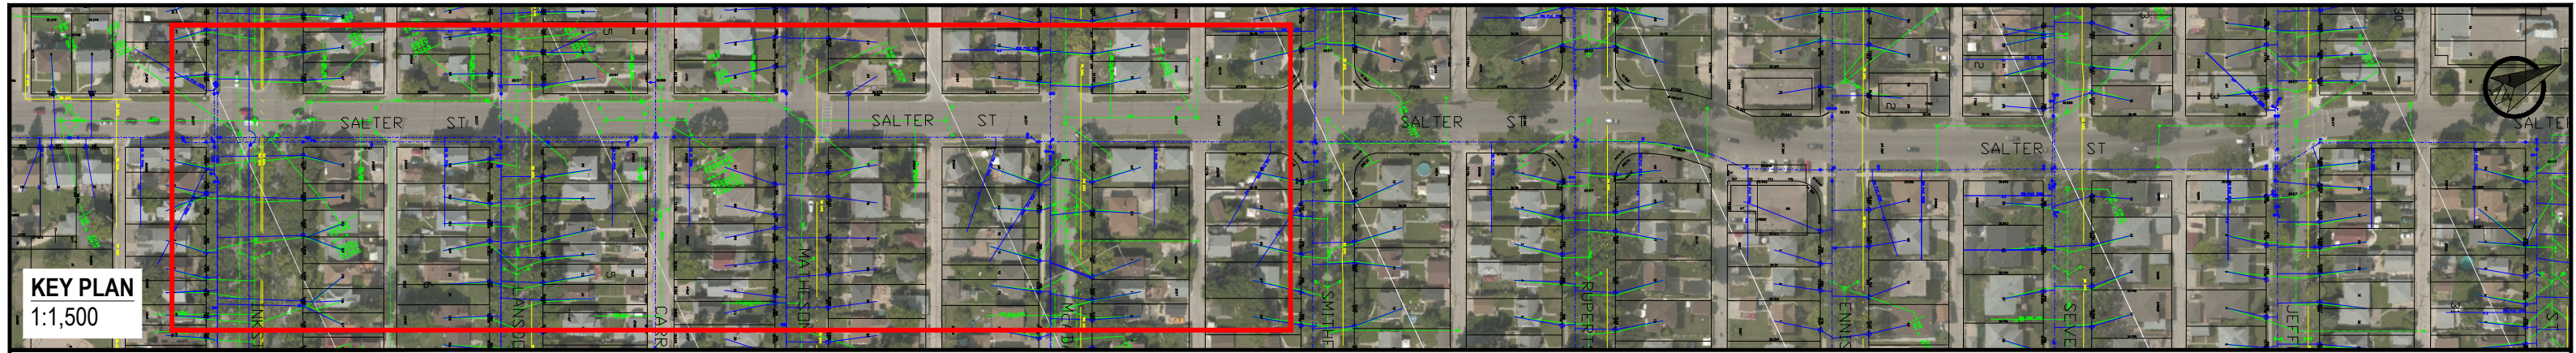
SALTER STREET CORE HOLE LOCATION PLAN
